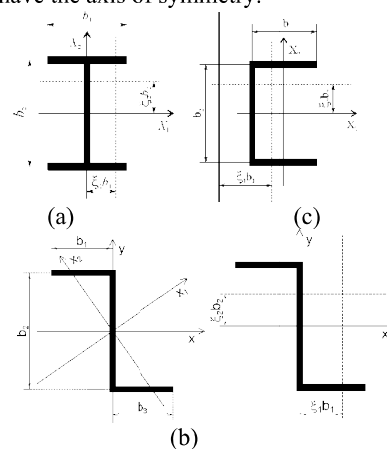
Cross-section: a) I-beam, b) Z-beam, c) U-beam
